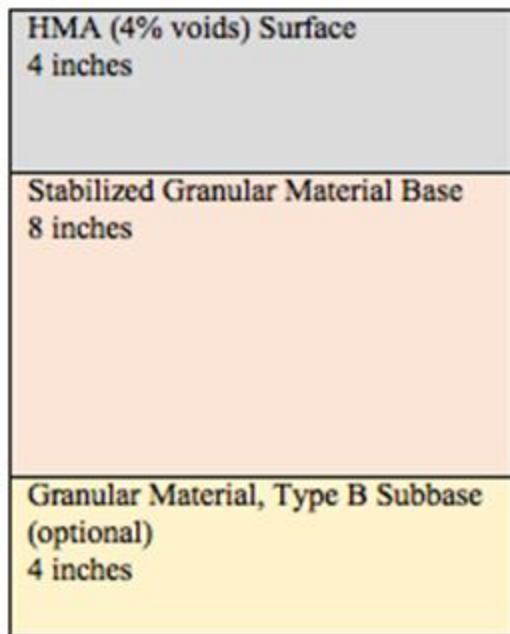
Ford Entrance Expansion Pavement Cross Section
